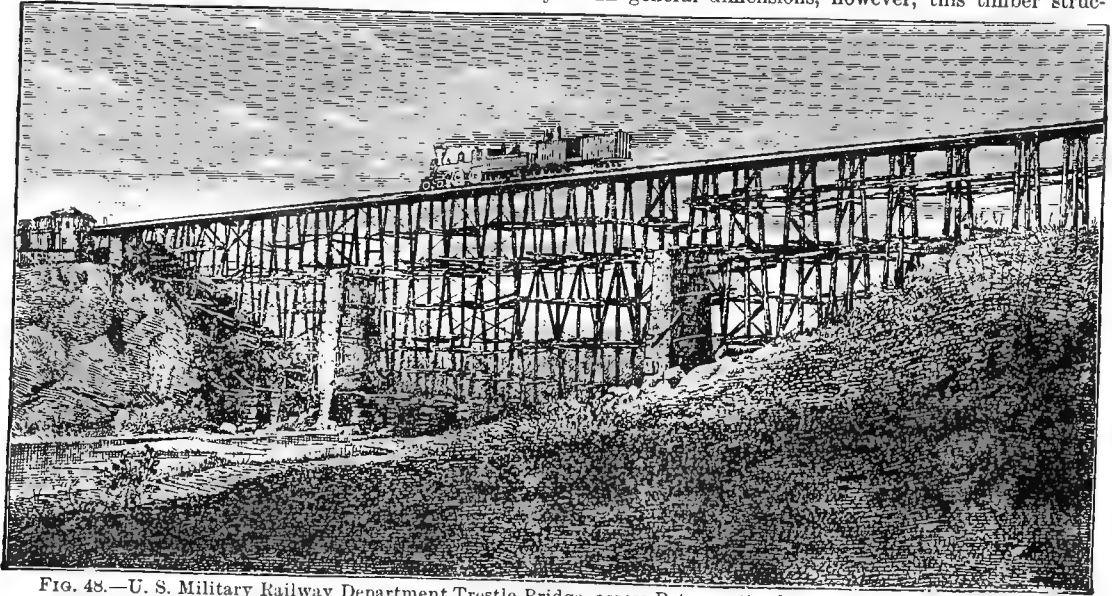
U. S. Military Railway Department Trestle Bridge, across Potomac Creek on Fredericksburg R. R., Va.
